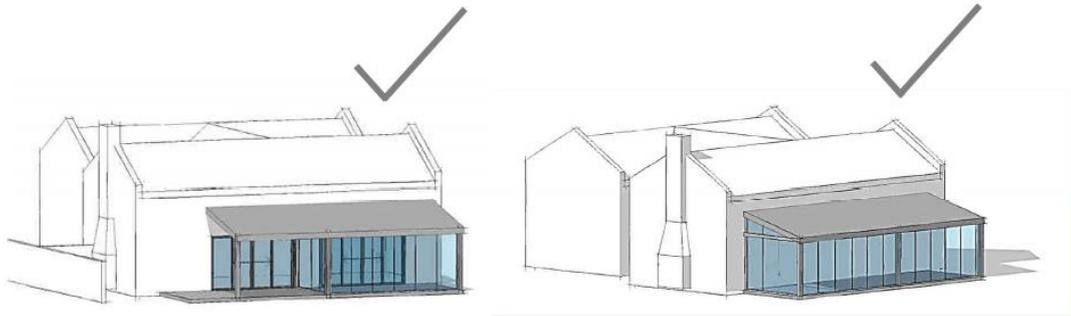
Example of a verandah half or fully enclosed with glazing.
